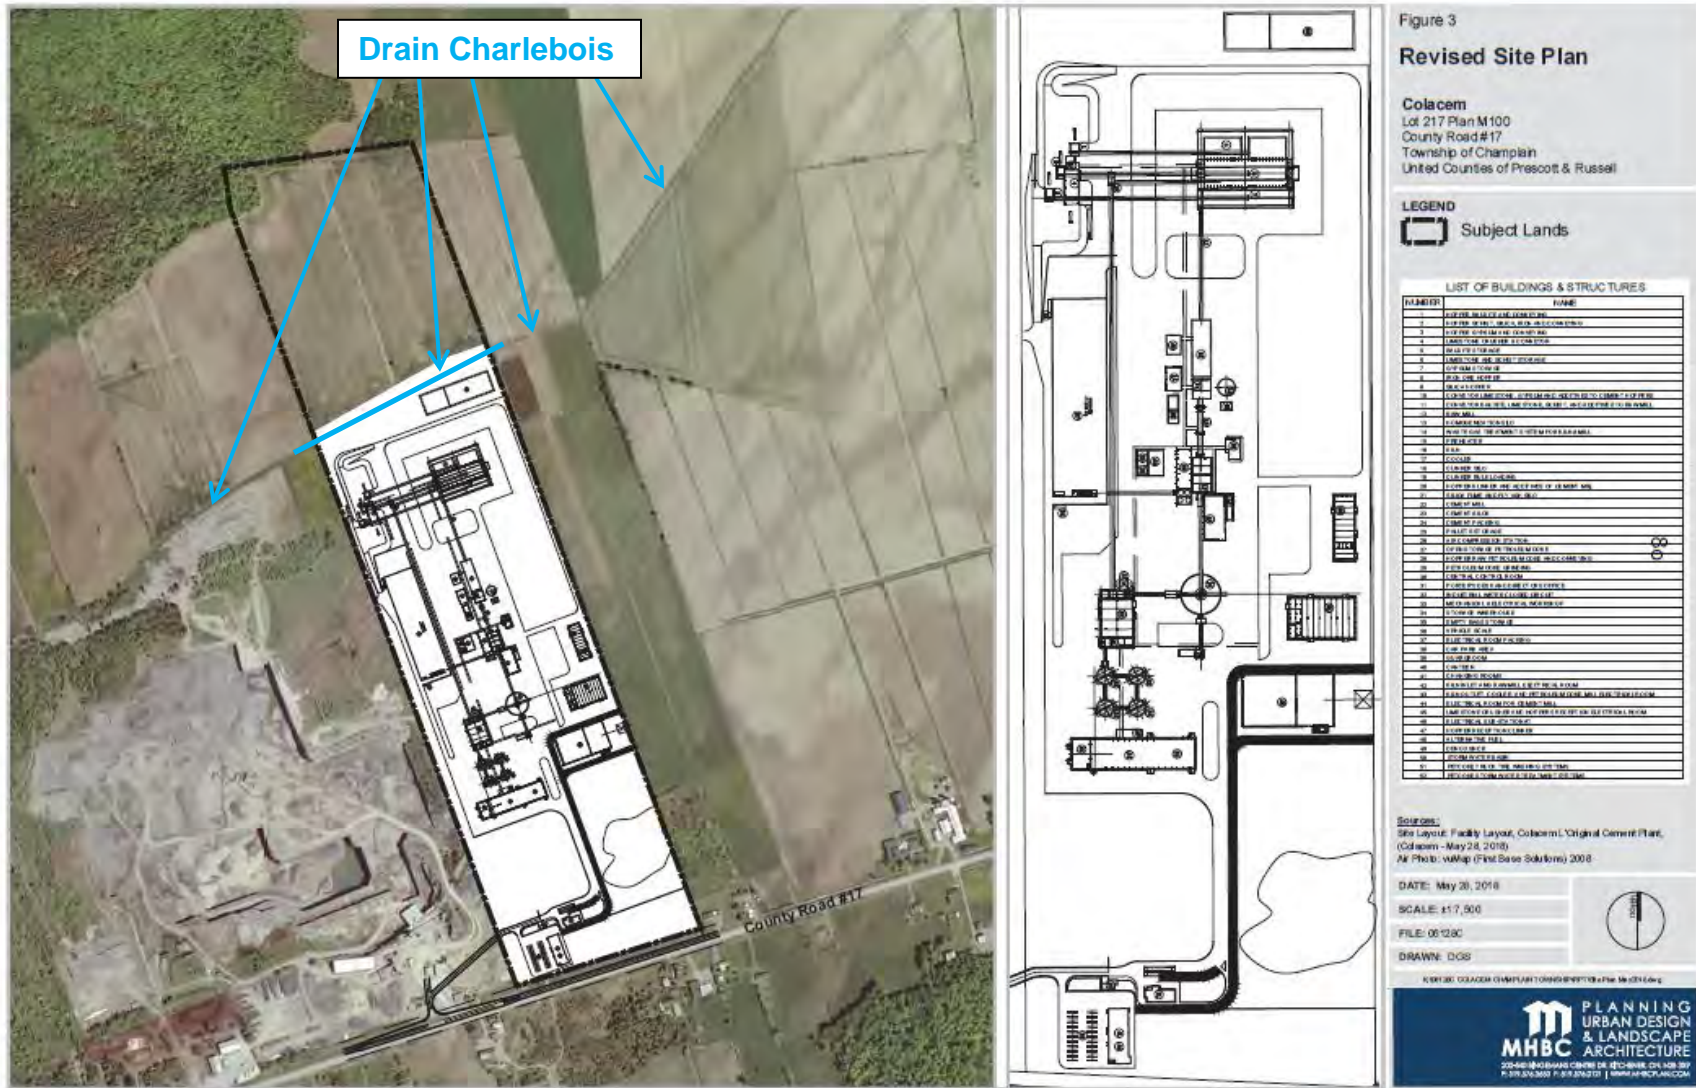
Colacem’s proposed cement plant Revised Site Plan dated May 28, 2018. Screen capture of page 80. ⁴ The Drain Charlebois has been added in blue where the site overlaps its course and arrows were added to point to the Drain Charlebois.
